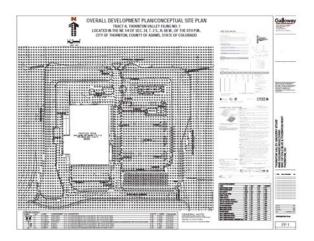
TYPICAL PHOTOMETRIC PLAN²
